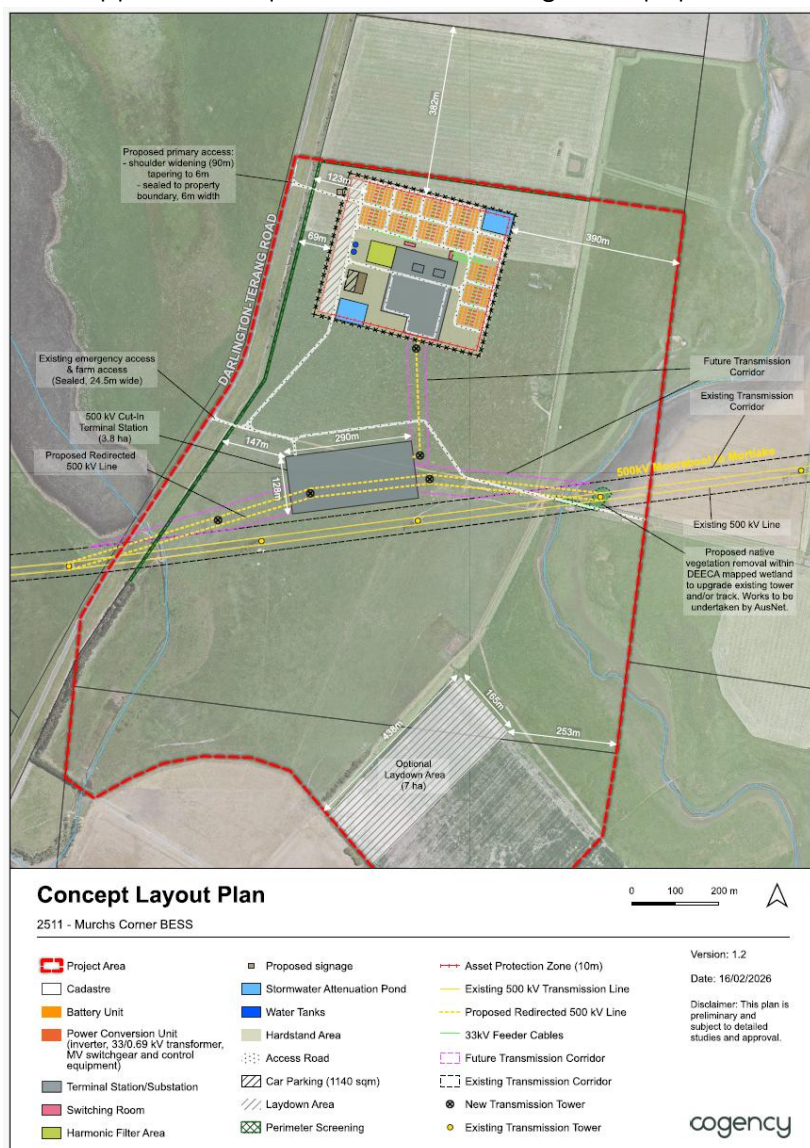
Proposed Murchs Corner BESS indicative site layout. Source: Decision Plans
